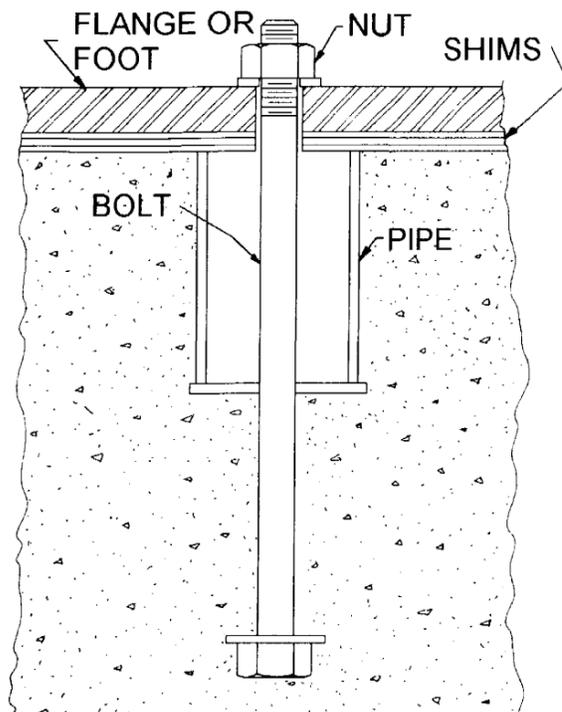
Sleeved anchor bolt
